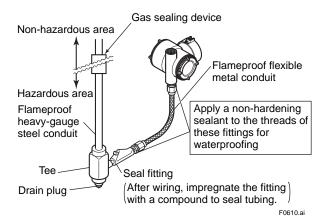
Typical Wiring Using Flameproof Metal Conduit
